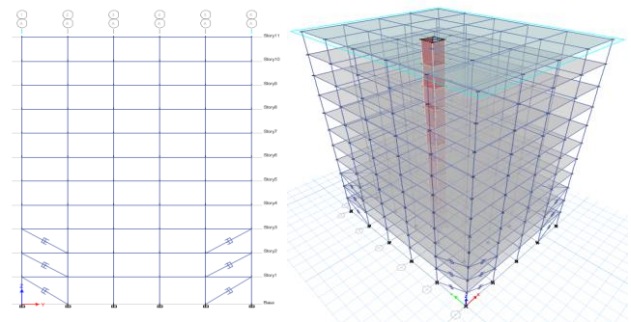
RCC building with corner FVD damping for bottom 3 storey's.
